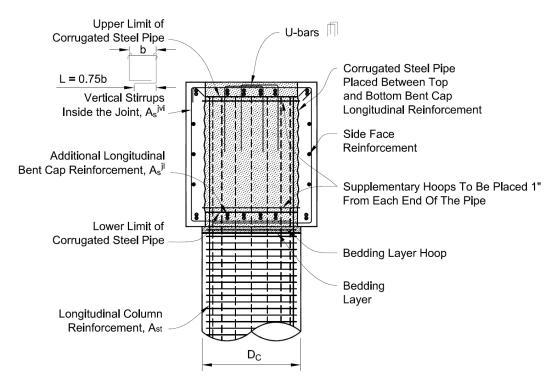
Cap Pocket Full Ductility Joint Shear Reinforcement Details (Section)—SDCs C and D
